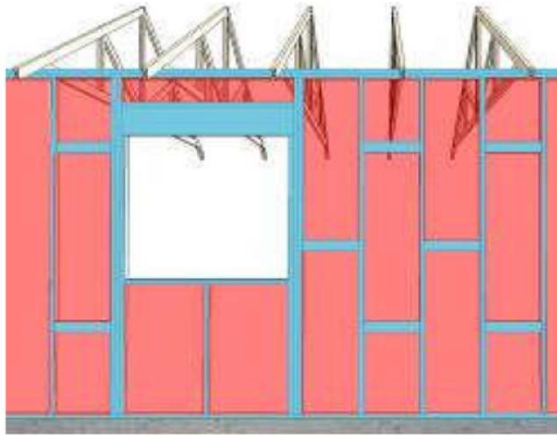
Example of Unaligned Wall and Roof Structure Requiring a Double Top Plate
